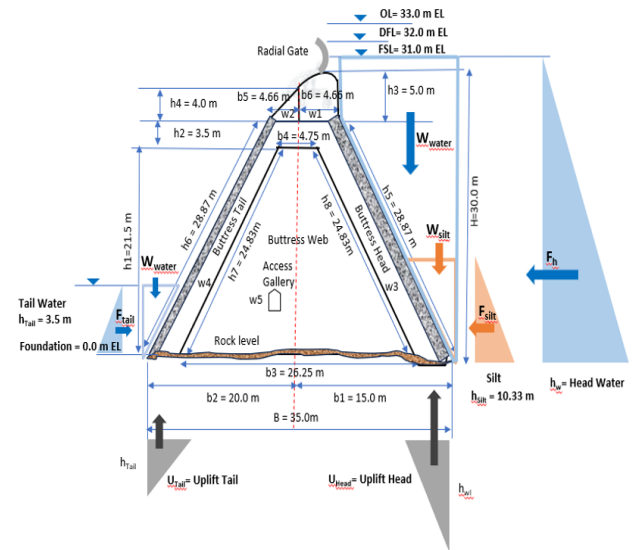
A typical cross-section of the buttress hollow spillway and its forces
